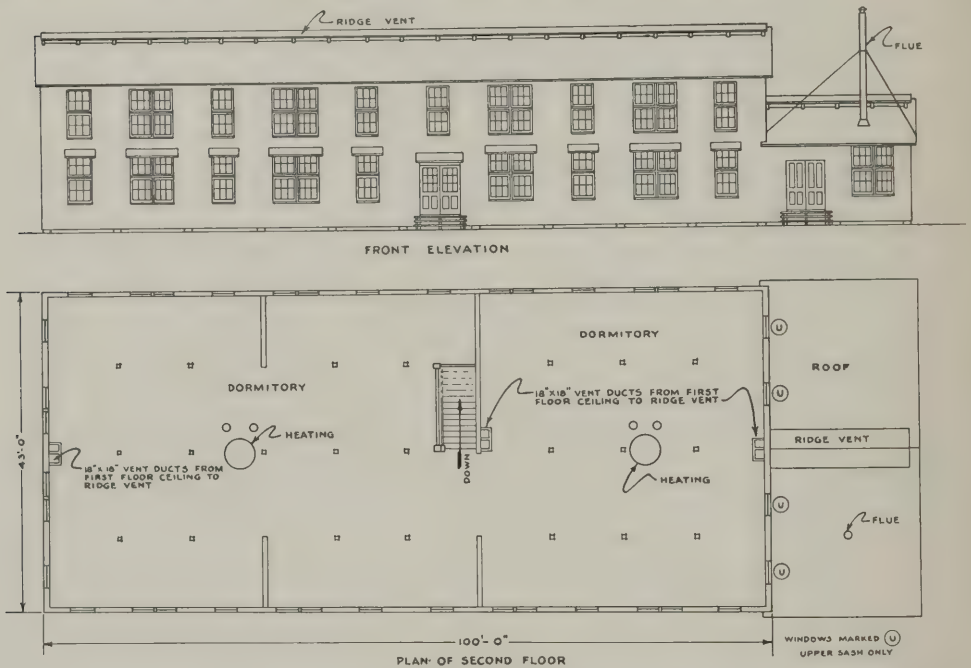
Two-story barrack for 167 men, providing about 36 square feet of floor space and 360 cubic feet of air space per man. Provides full ridge ventilation for upper story and three shafts for lower story
